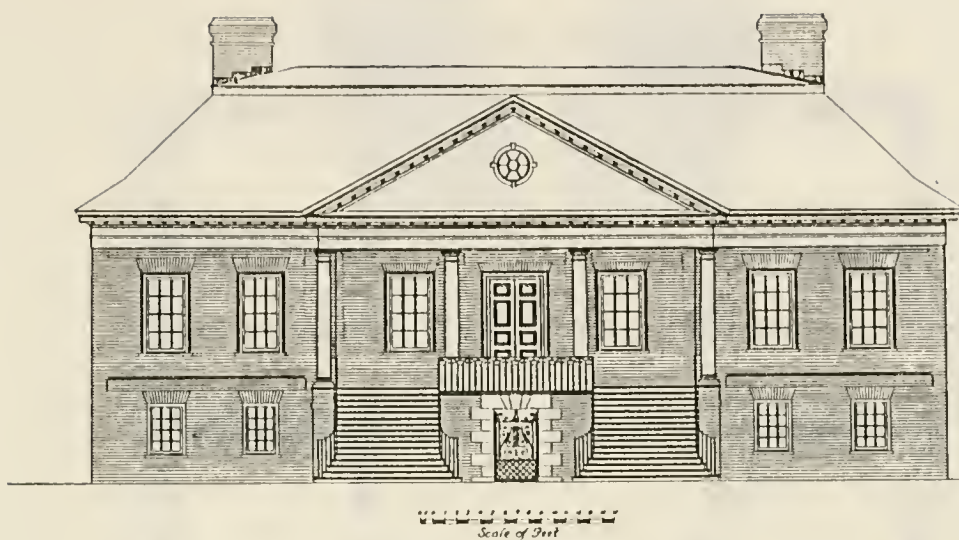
Conjectured west facade of Drayton Hall as a one-story building (RGF after drawings by Thomas and Seel in Stoney)
